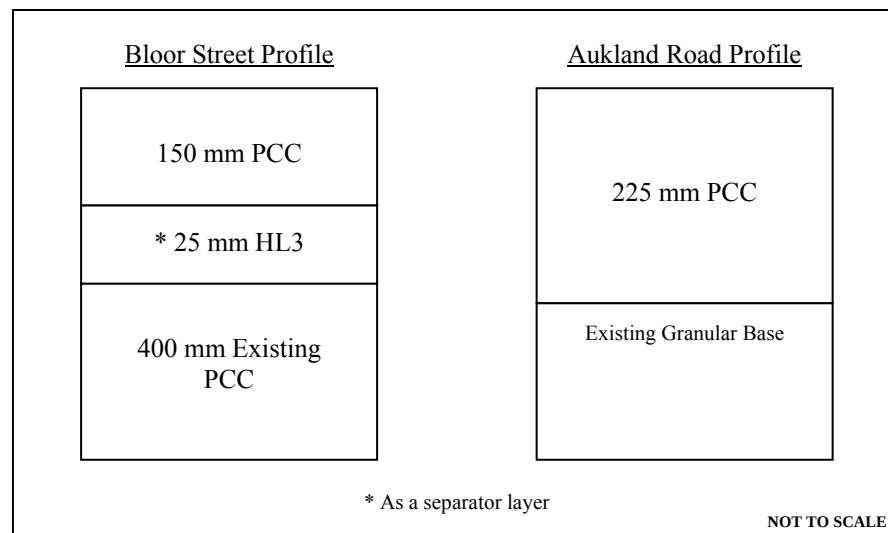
Concrete Overlay Designs for Bloor Street and Auckland Road
